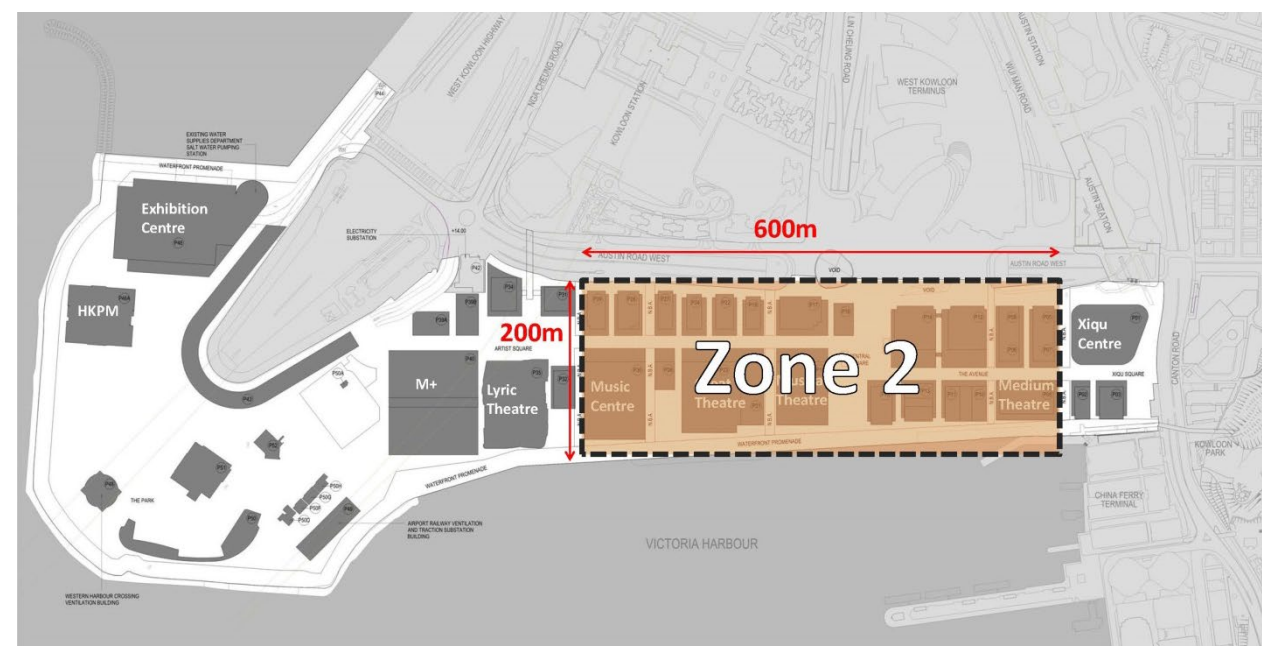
Overall Site Plan for Zone 2 (Zone 2A, 2B and 2C)
